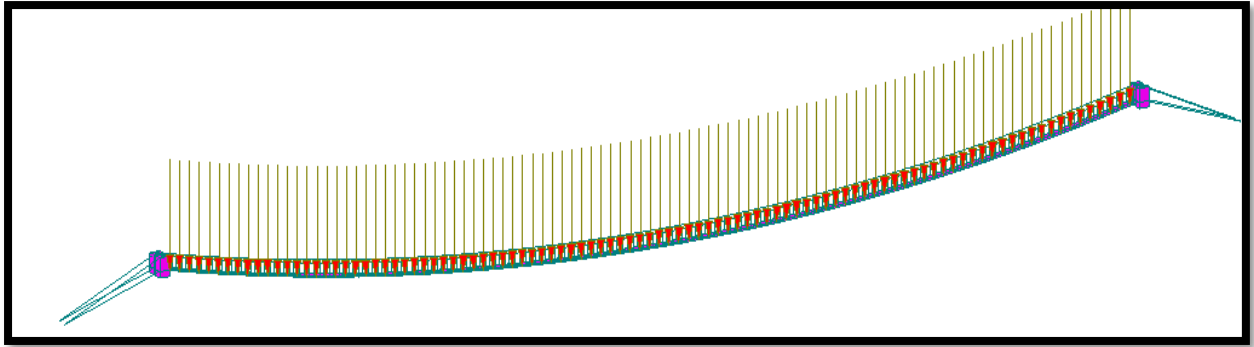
Typical pedestrian cable suspended bridge for Walking pedestrian.
